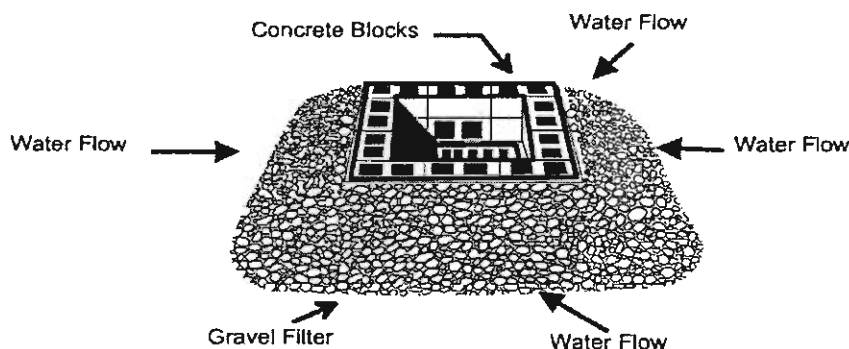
Typical Block and Gravel Drop Inlet Protection
